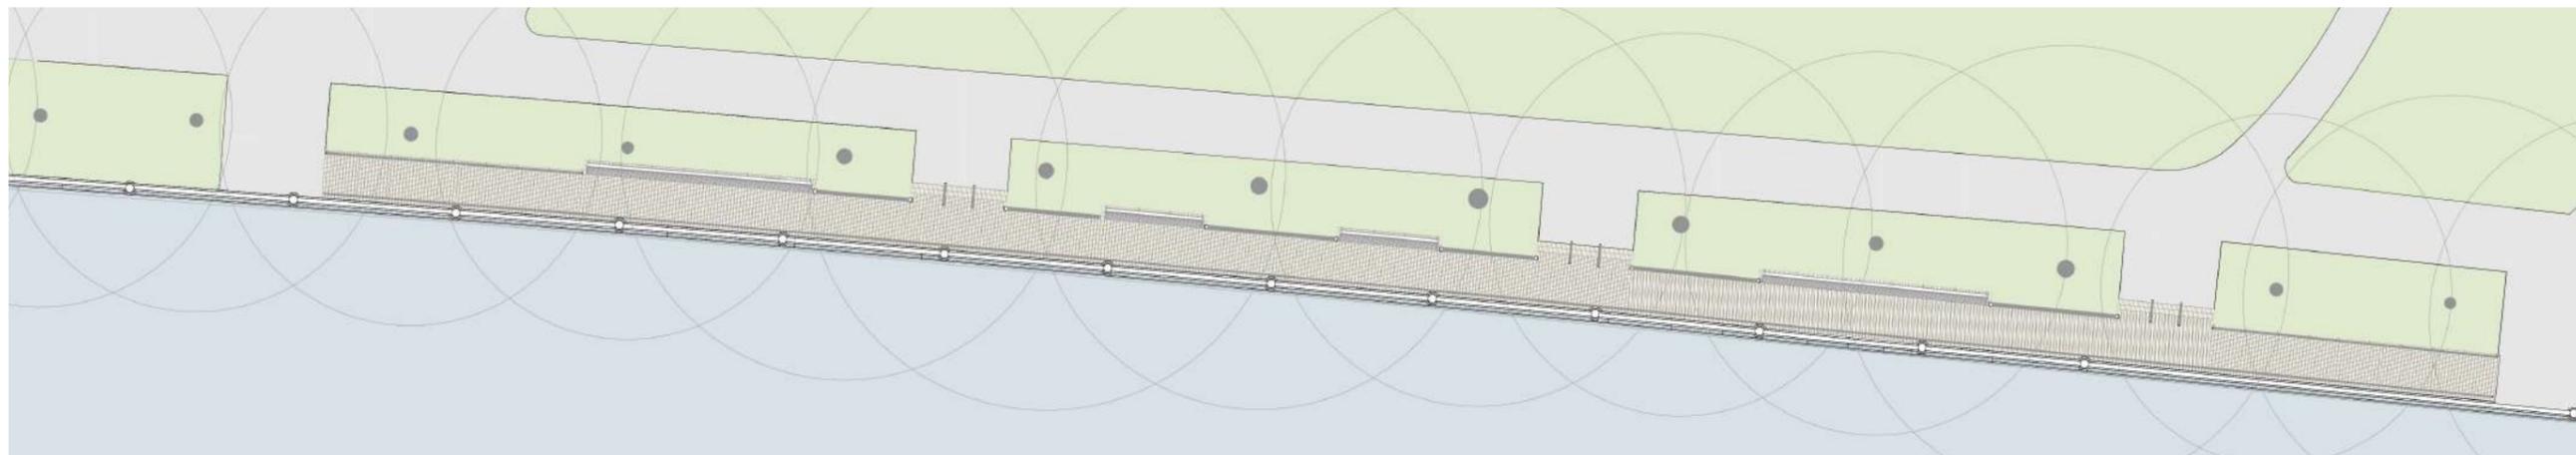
PLAN OF BOARDWALK AND SEATING AREAS
